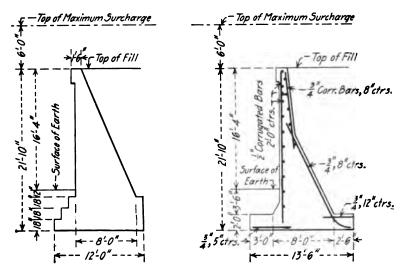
h. C. B. & Q. R. R. RETAINING WALLS.
